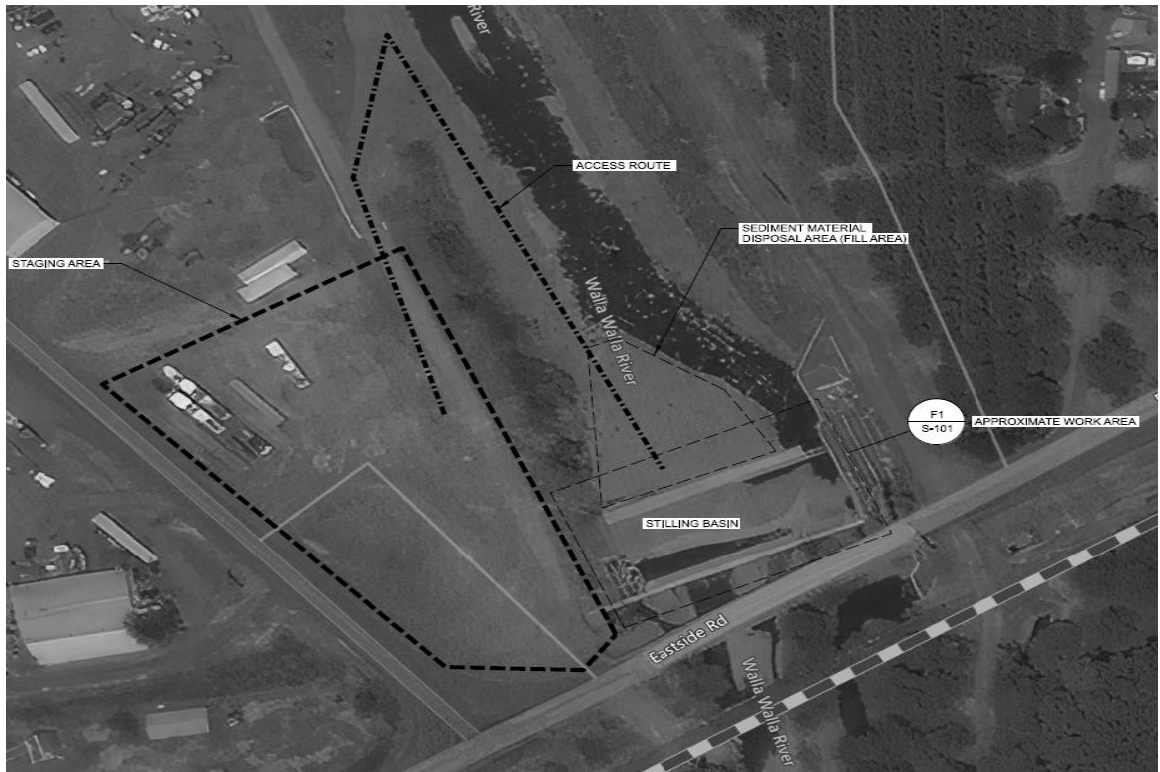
The 2022 Nursery Bridge Drop Structure repair project in the Walla Walla River, Oregon.
